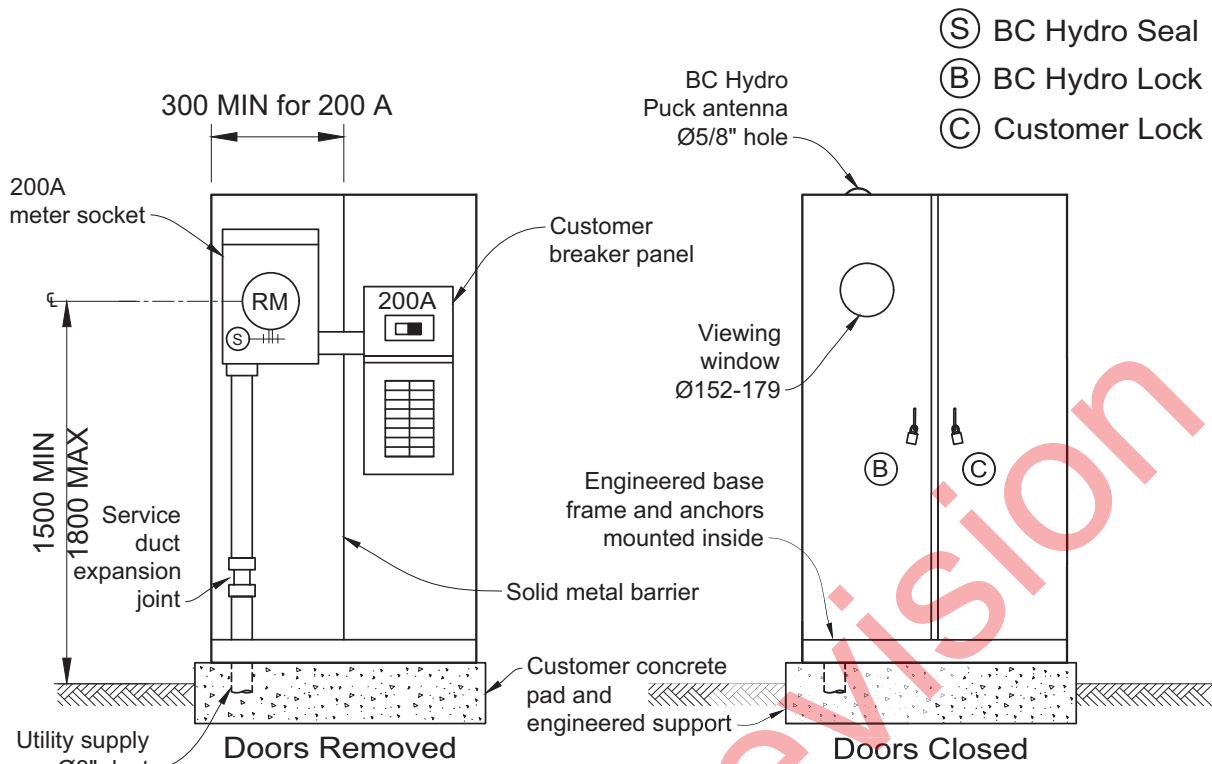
Kiosk with revenue meter socket mounted inside enclosure
